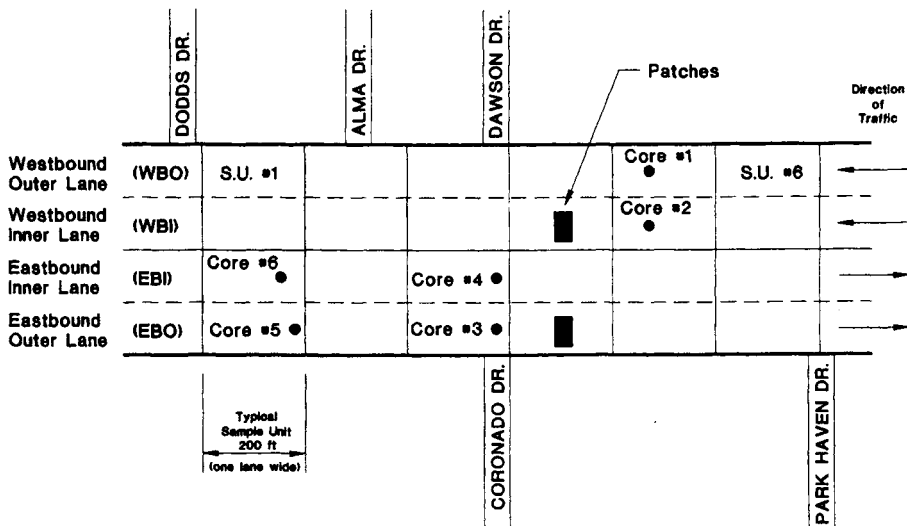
Division of Kirby Avenue into Sections and Sample Units.
